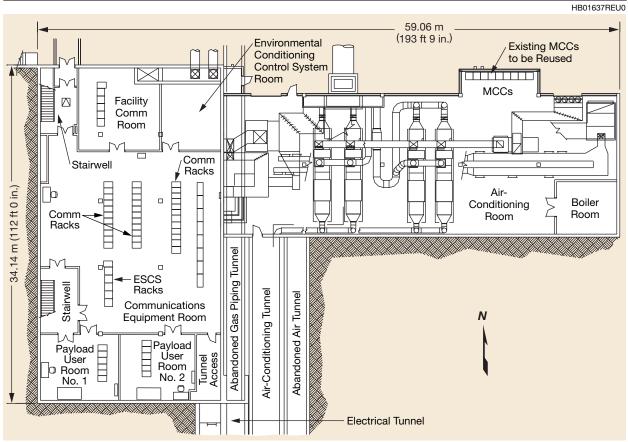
Support Equipment Building (SEB) (Building 395) First-Floor Plan
